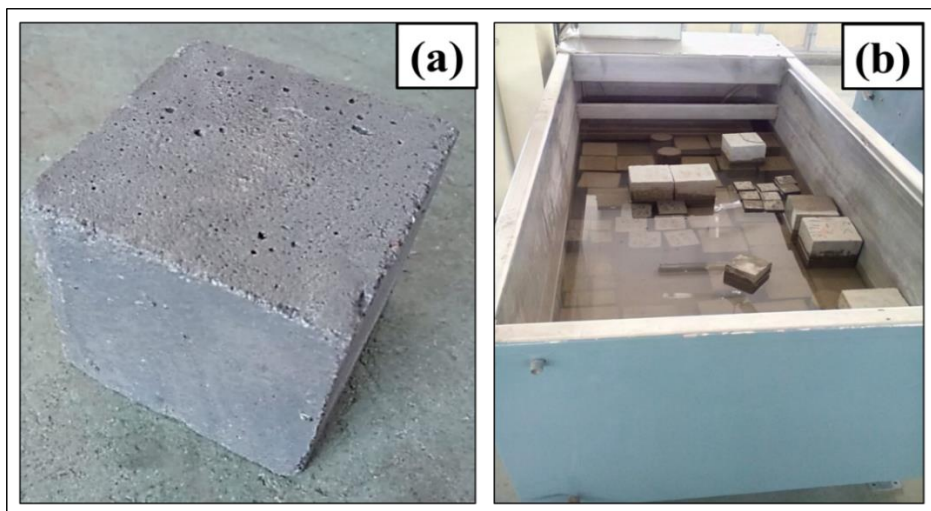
(a) Demolded Cubic Specimen after 24 Hours of Molding (b) Curing Tank with Standard Temperature Regulator
